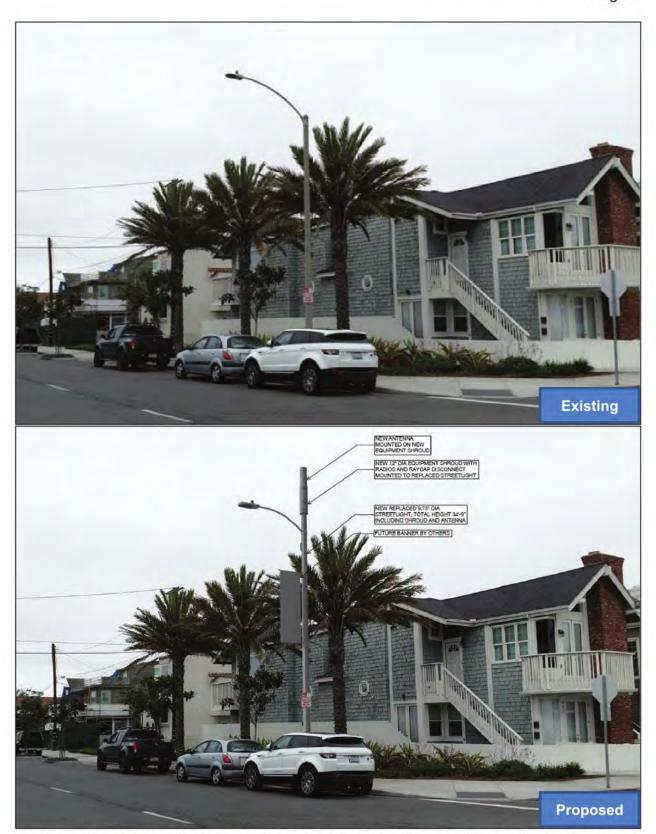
, Existing photograph (top) with proposed rendering (bottom) showing the replaced streetlight pole, antenna, equipment shroud, and below-grade equipment handholes. The banner is only shown for reference and is not part of this proposal.
